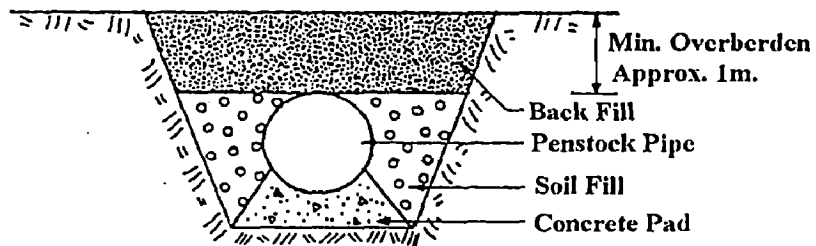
TYPICAL CROSS-SECTION OF BURIED PENSTOCK
